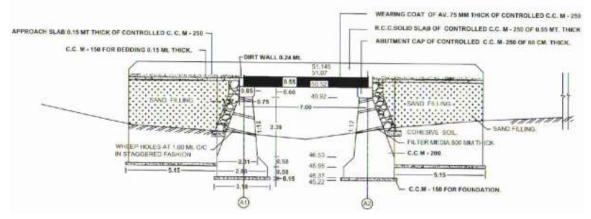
Typical Cross section – Plate 5 (Existing Causeway Elevated by Slab)
